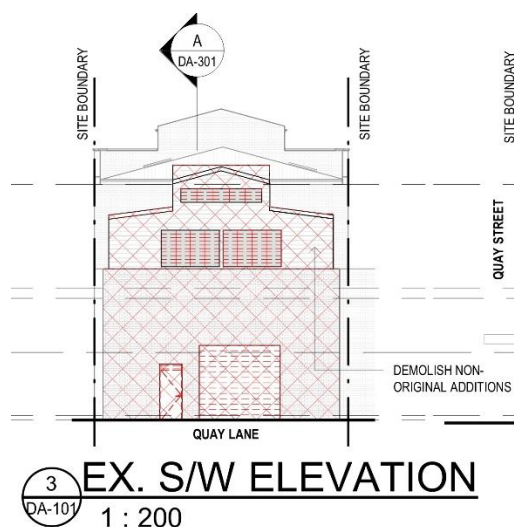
Existing South-West (Quay Lane) Elevation showing that the full extent of the circa 1970s rear addition is proposed to be demolished while the original blade walls on the side boundaries are to be retained and integrated into the new building work. (Source: Feather & Lawry Design)
